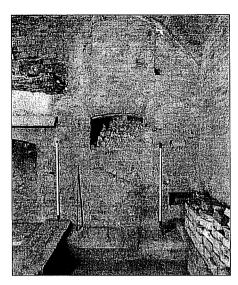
East of plate 7 showing earlier blocked opening. (Archive - Photo 14)
